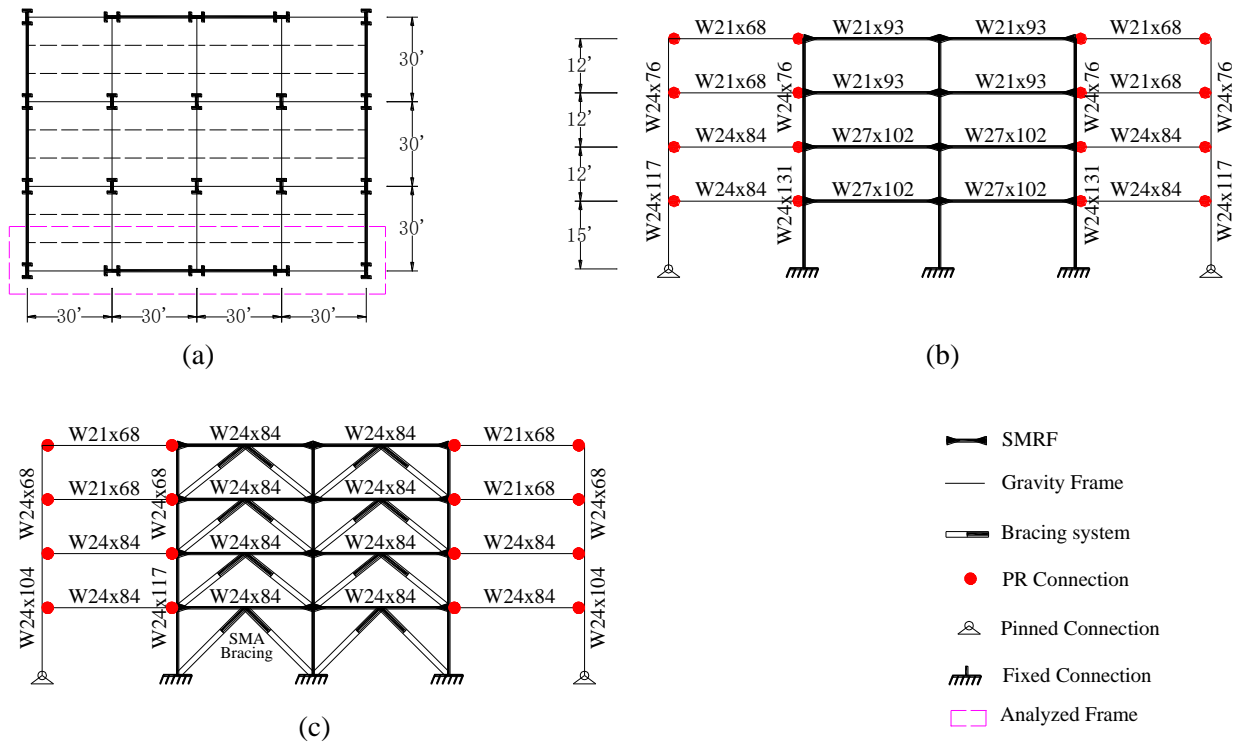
Structural model illustration: (a) Plan view, (b) SMRF Frame and (c) SMA Braced Frame
